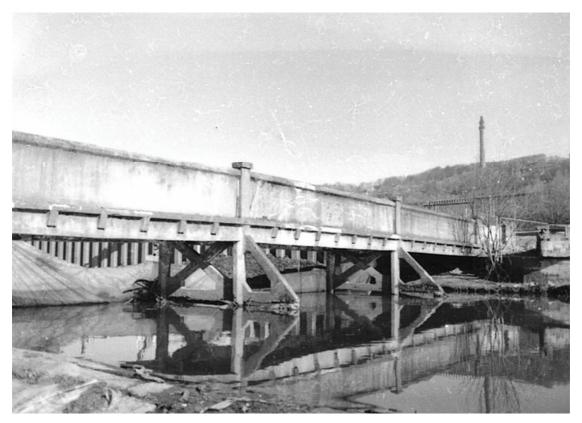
North-facing view showing south-east-facing bridge elevation, trestles (4a) and (4b), and cut-waters (5) and (5a) (MF SB03_05)
